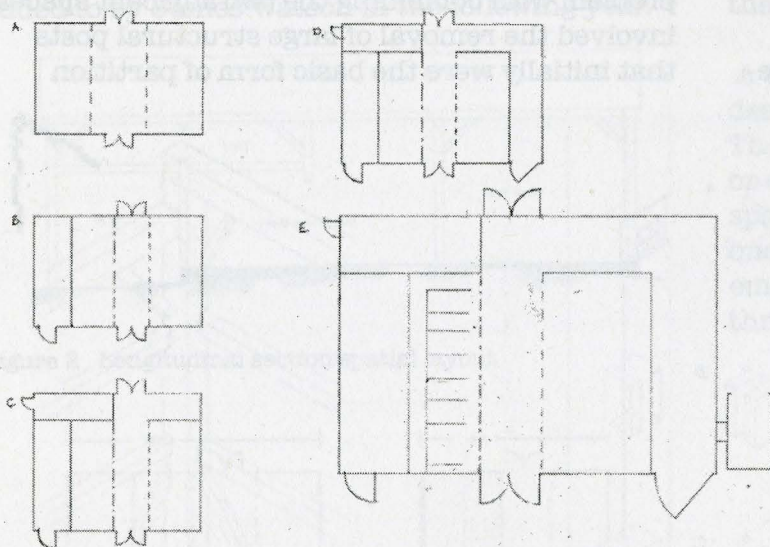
Plan Development: (a.) The traditional English three-bay, (b.) Ridgeway's narrow four-bay design, (c.) the full length shed roof on the west elevation, (d.) the north shed roof below the gable, and (e.) as it is today with the north side scale shed and animal stalls in place of the threshing floor.
